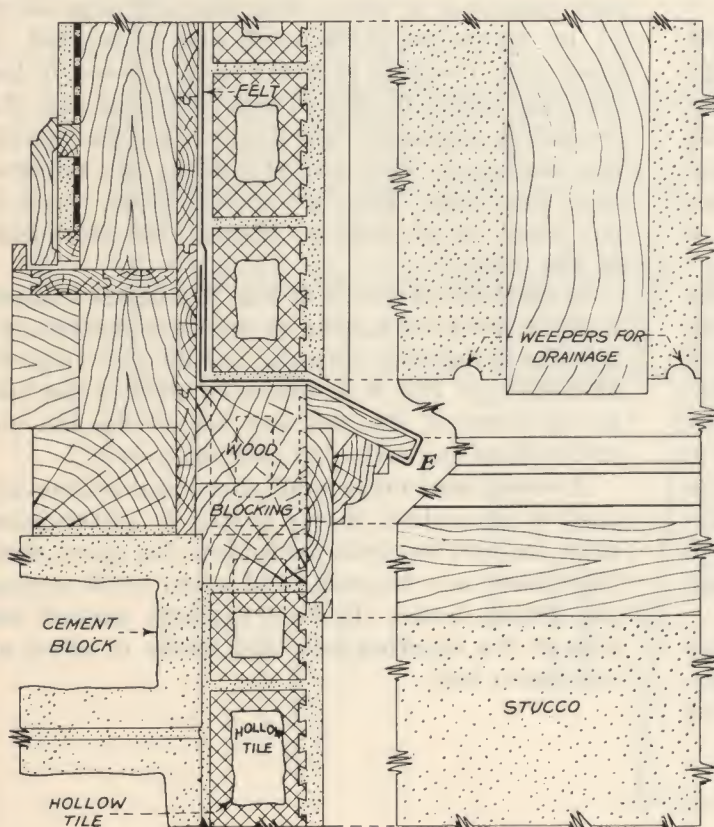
FLASHING WATER TABLE ON HOLLOW TILE AND STUCCO WALL - SCALE $1\frac{1}{2}" = 1'-0"$
